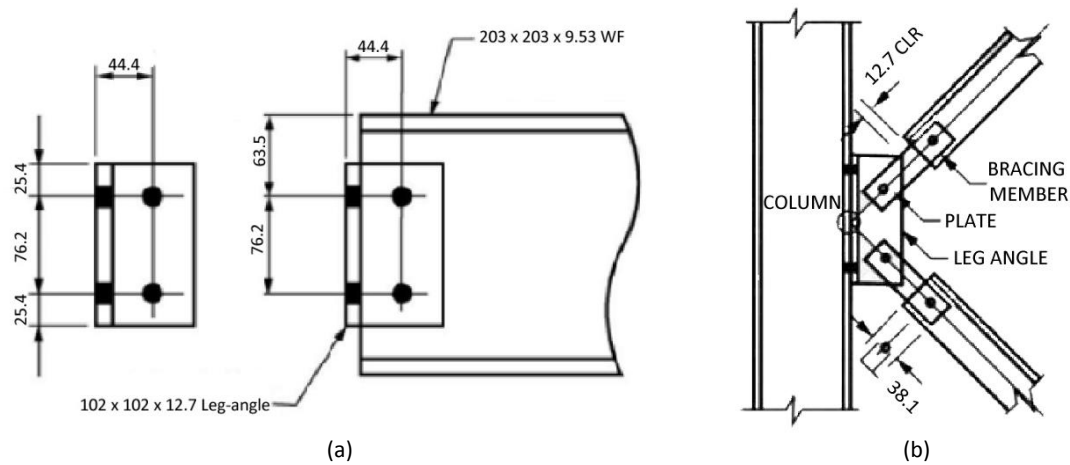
Typical Frame Connection Detailing adapted from Strongwell (2013) showing (a) Beam-to-Column and (b) Bracing Members
